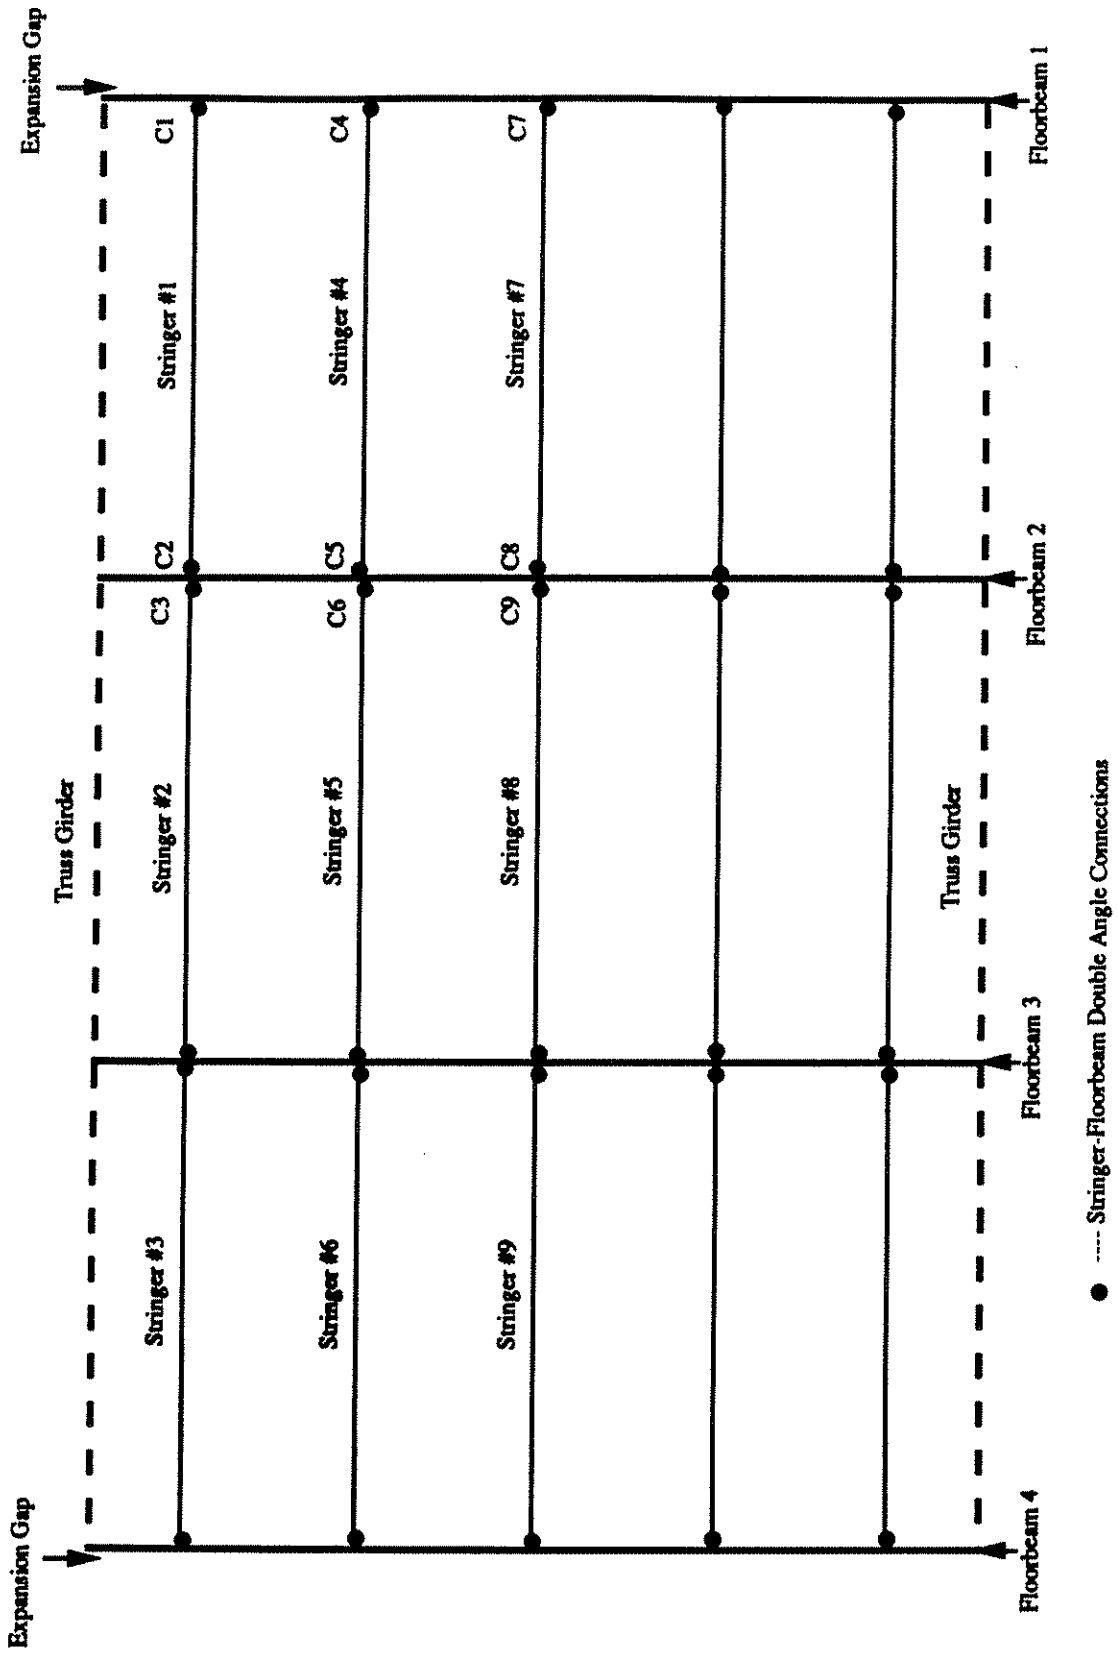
Plan of Bridge Floor System Between Expansion Joints
